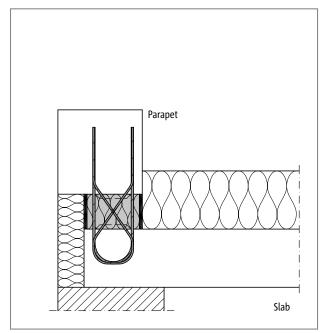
Schöck Isokorb® XT type A: Connection of a parapet (XT type A-MM1)
